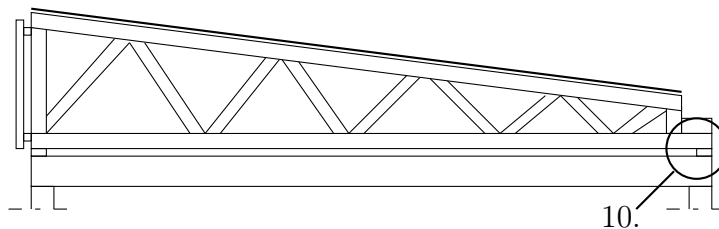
Visualisation of a roof truss for the mono-pitch roof, and its connection to the ceiling of the top TVE.
